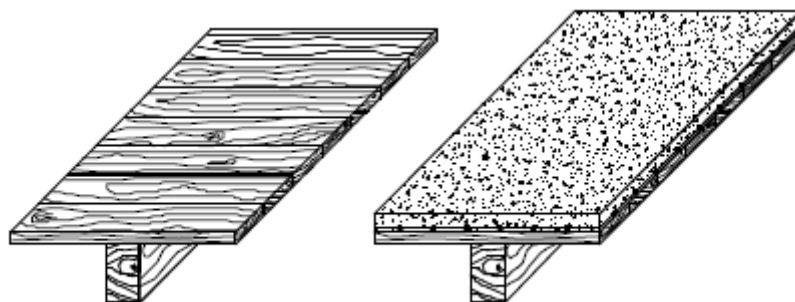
Transformation of a traditional wooden floor into a composite wood-concrete floor
